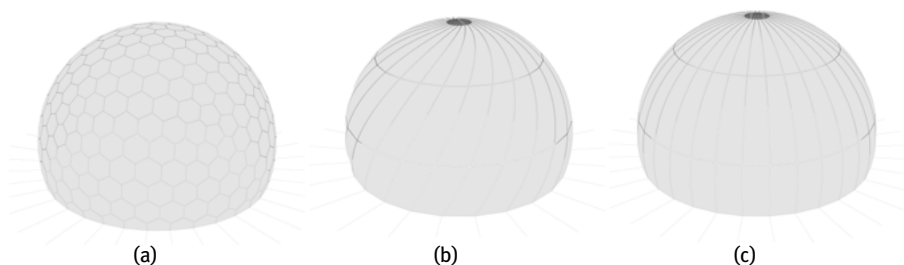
Preliminary design options: (a) geodesic layout, (b) slanted layout, (c) vertical layout.
